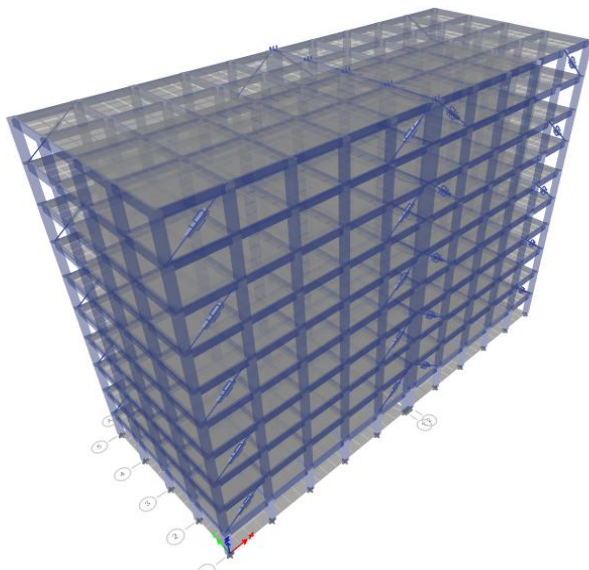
3-D Model Building with Dampers at Alternate floor Model 4
